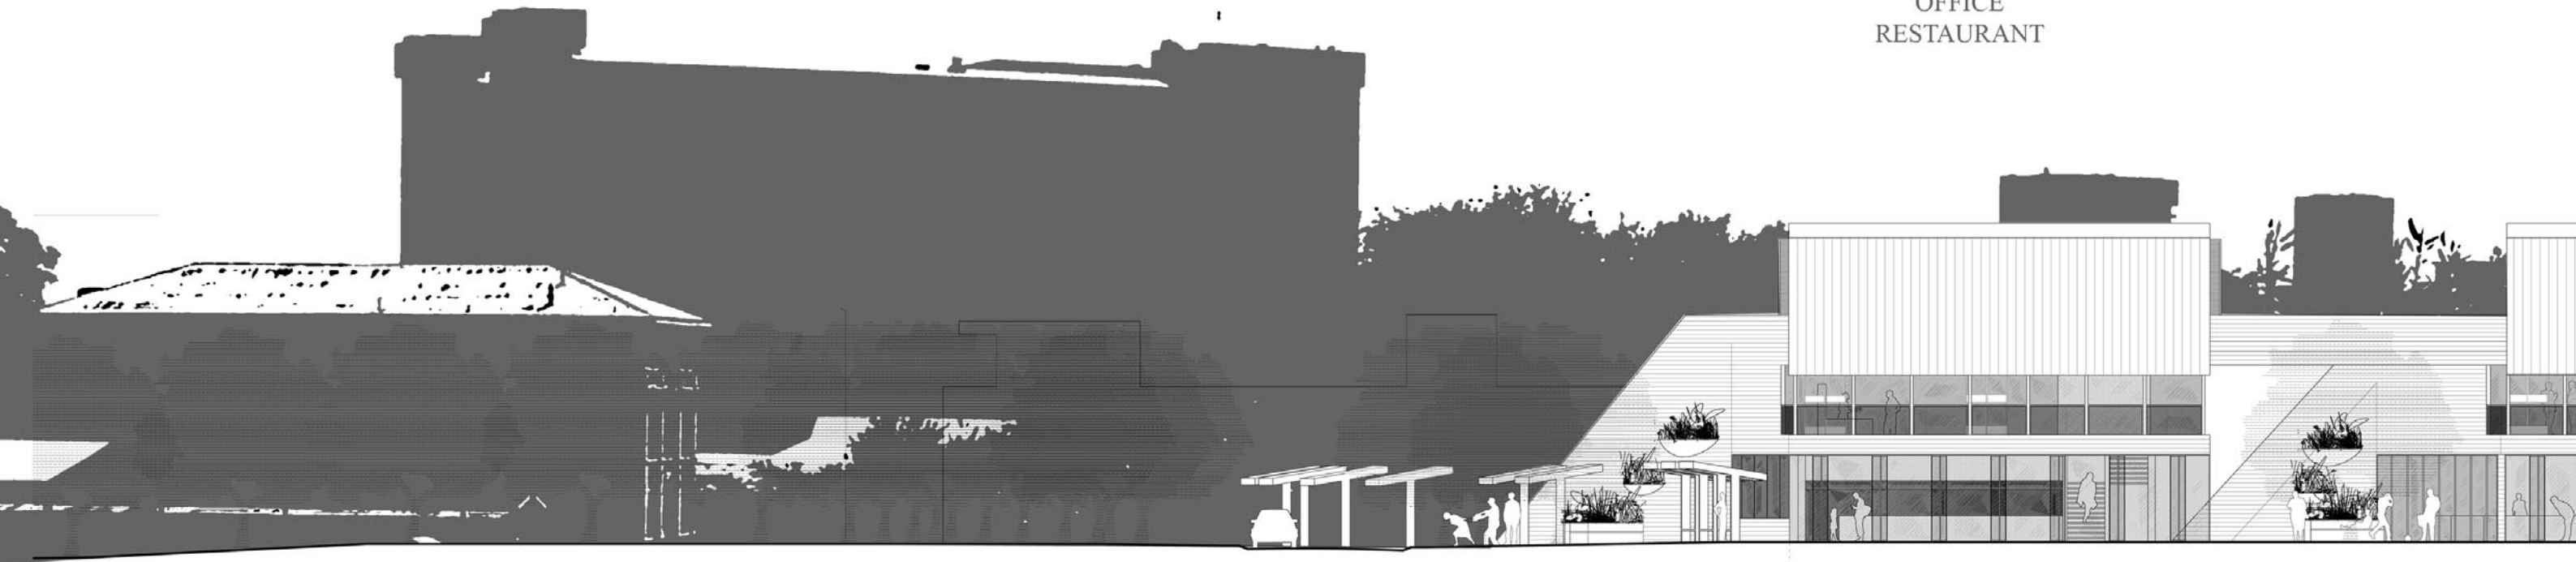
Longitudinal section, n.t.s (Author 2006)
